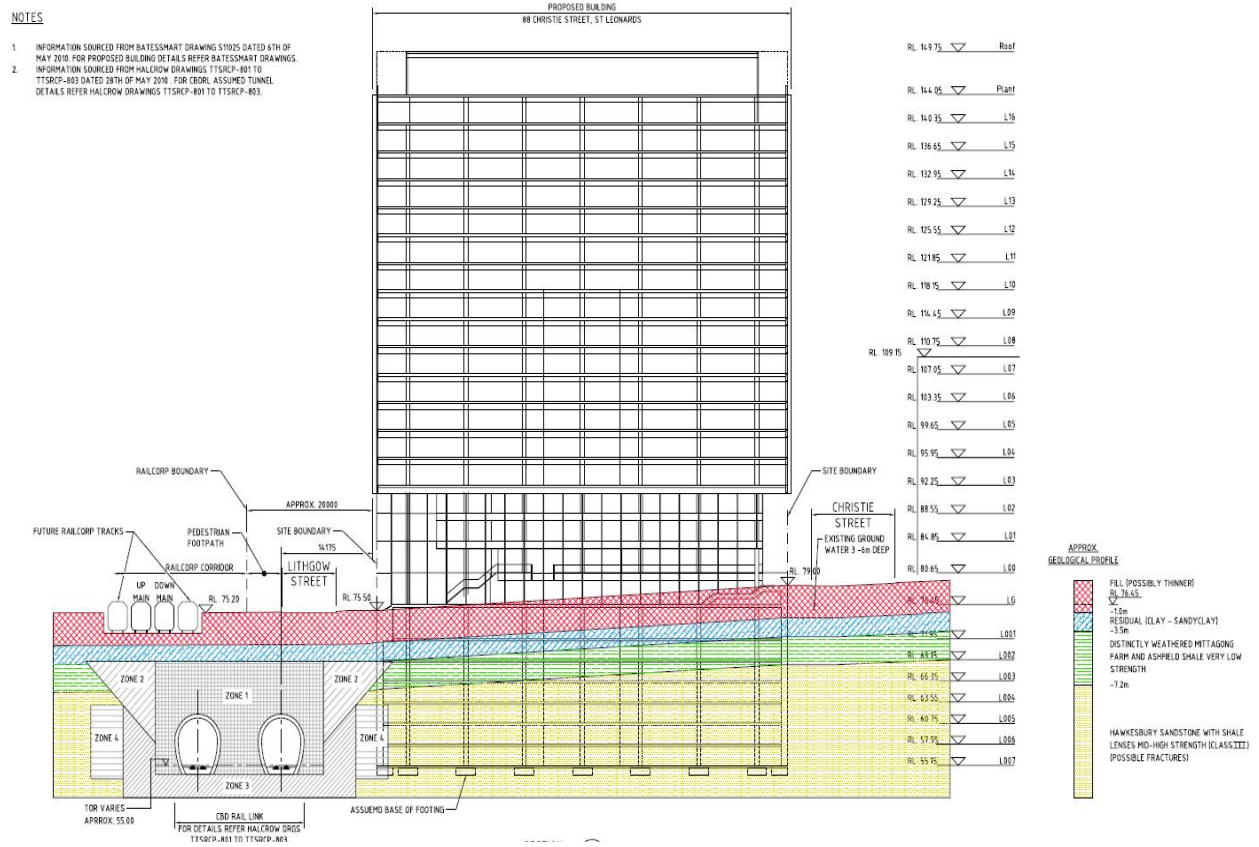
Development cross-section showing RailCorp corridor and proposed CBDRL tunnels
